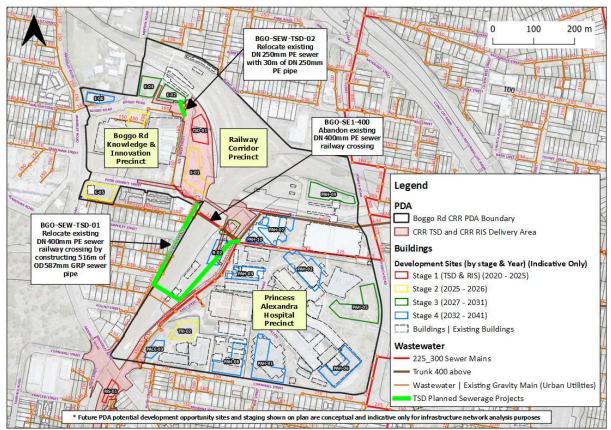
Existing and Currently Planned Sewerage Infrastructure
